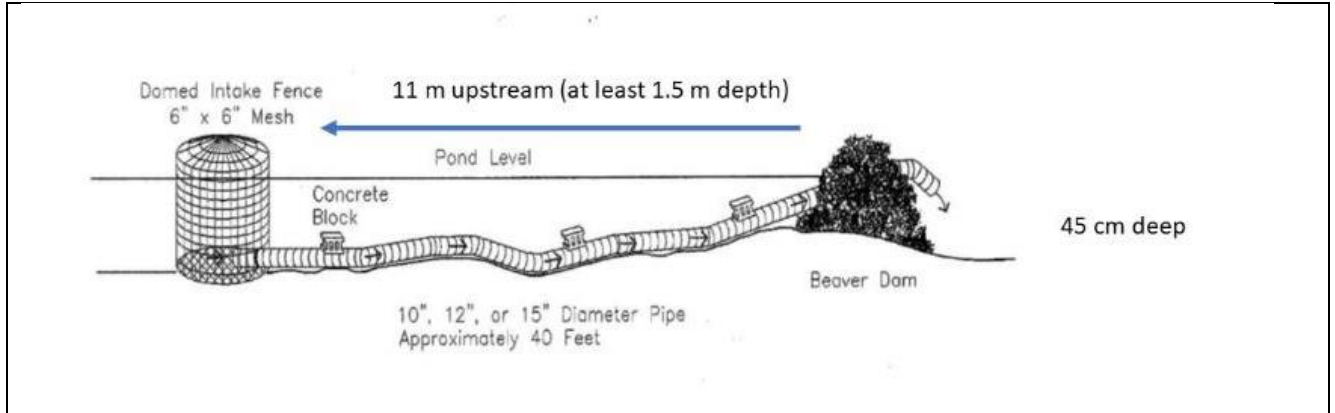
A schematic of the pond-leveler system installed at the large beaver dam near the southwest drainage culvert. Adapted from Beaver Solutions.
